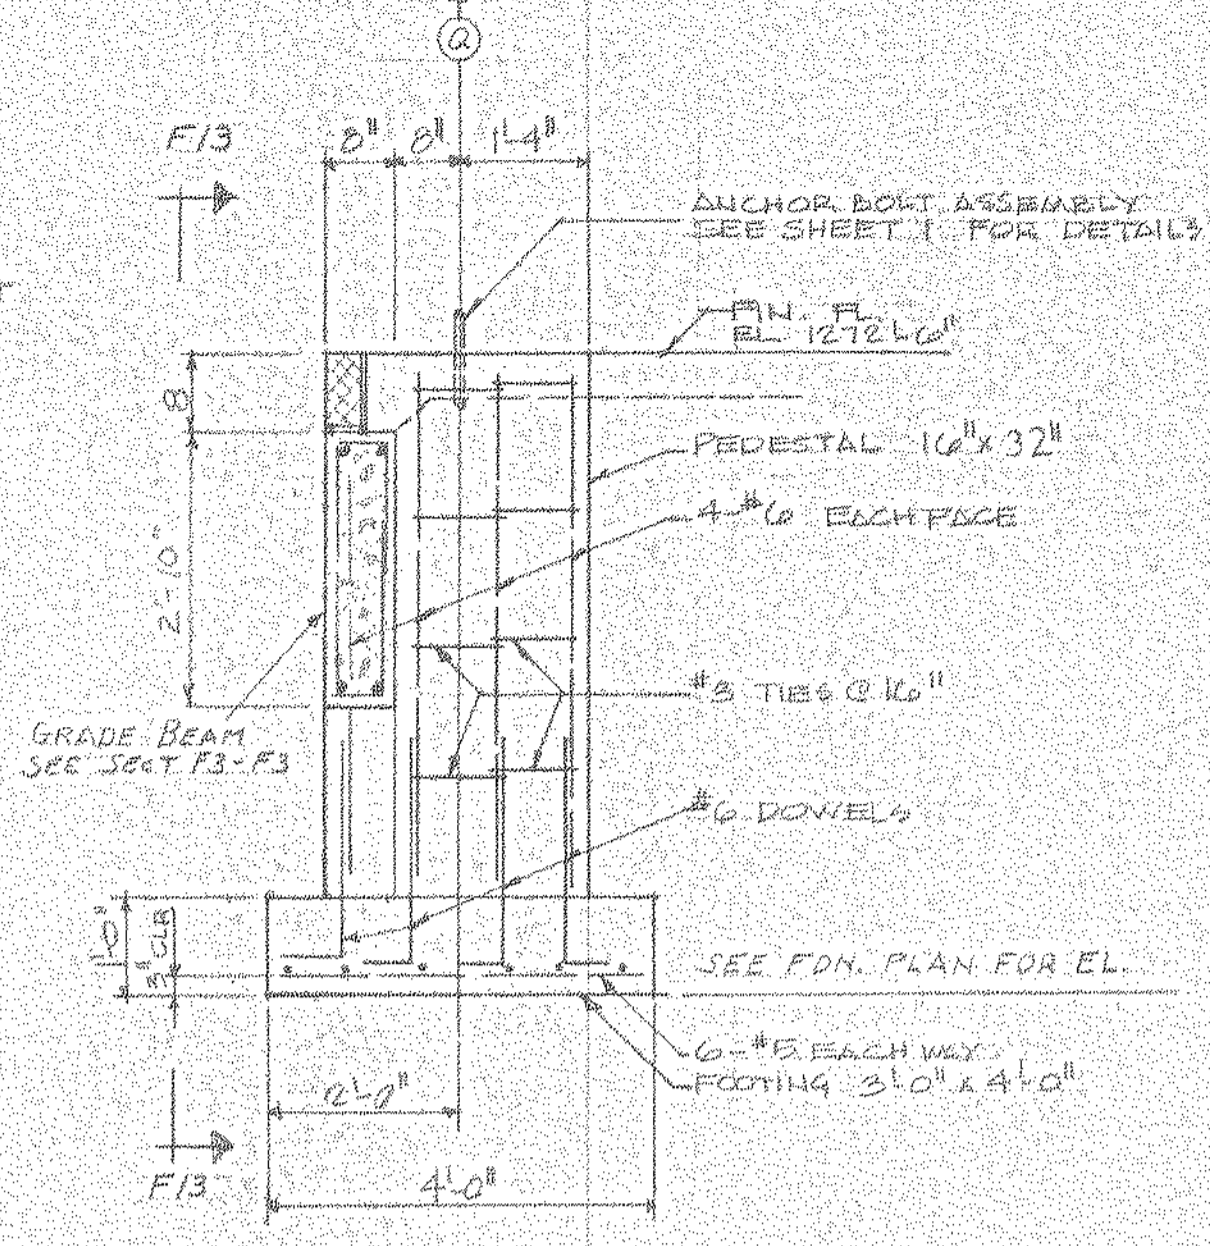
SCALE 1/2" = 1'-0" FOOTING "R"
